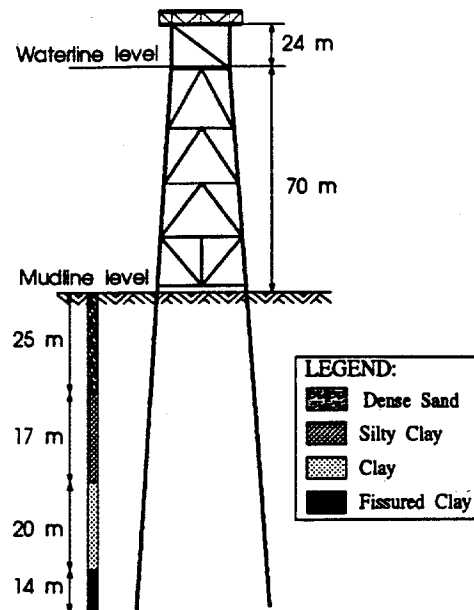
Schematic view of Riser 16/11S Platform with foundation and soil profile (figure not to scale).
